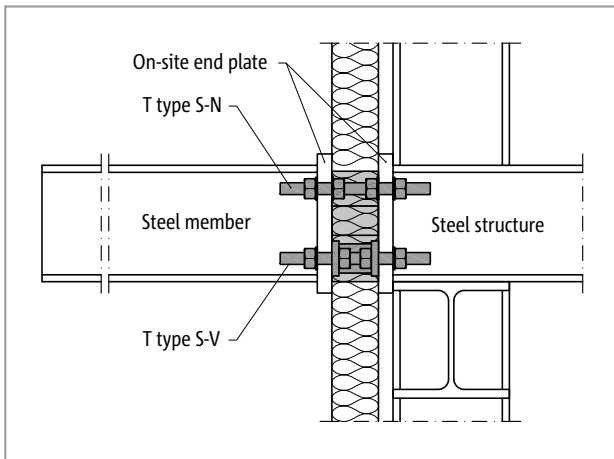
Schöck Isokorb® T type S for cantilevered steel structures
